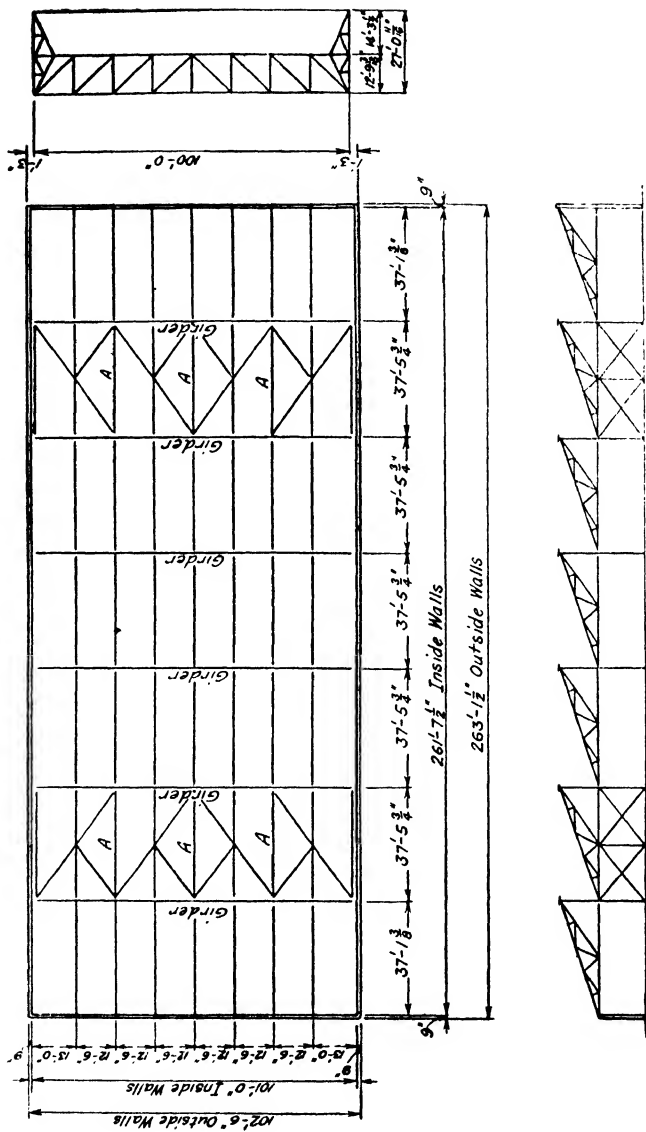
GENERAL ARRANGEMENT OF STEELWORK FOR MILL BUILDING
